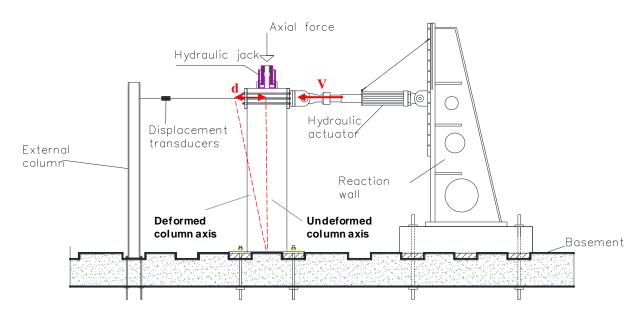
Test setup for the assessment of static and cyclic behaviour of the column element
